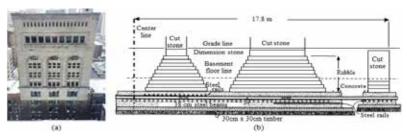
(a) Auditorium Building Tower (Author) and (b) Tower Foundation (http 7-Library of Congress, HABS).
